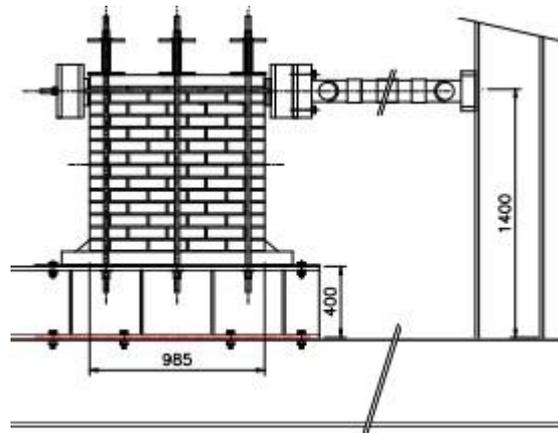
Test setup and dimensions in mm (Abrams, 2001)
